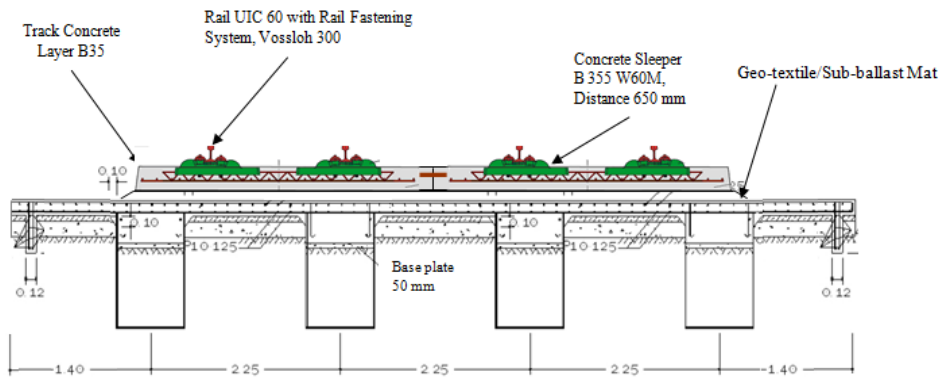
Design concept of slab track supported with Cakar Ayam foundation
